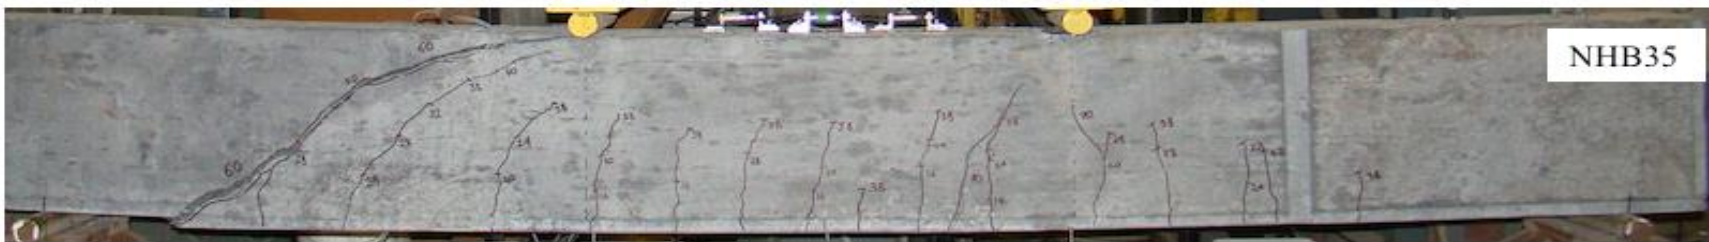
Crack patterns at failure of SFRC beams with short fibres (Group 2).
